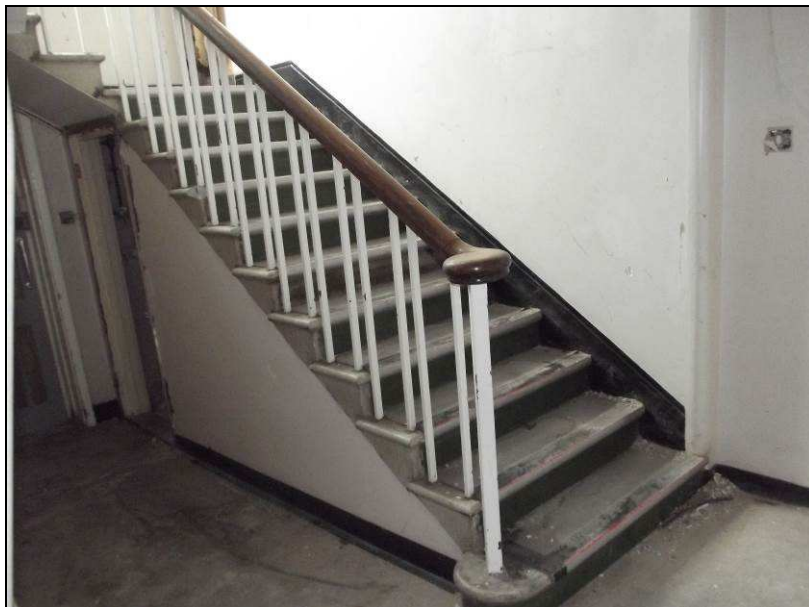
(shot 124): Main staircase of Barton House, looking southwest
